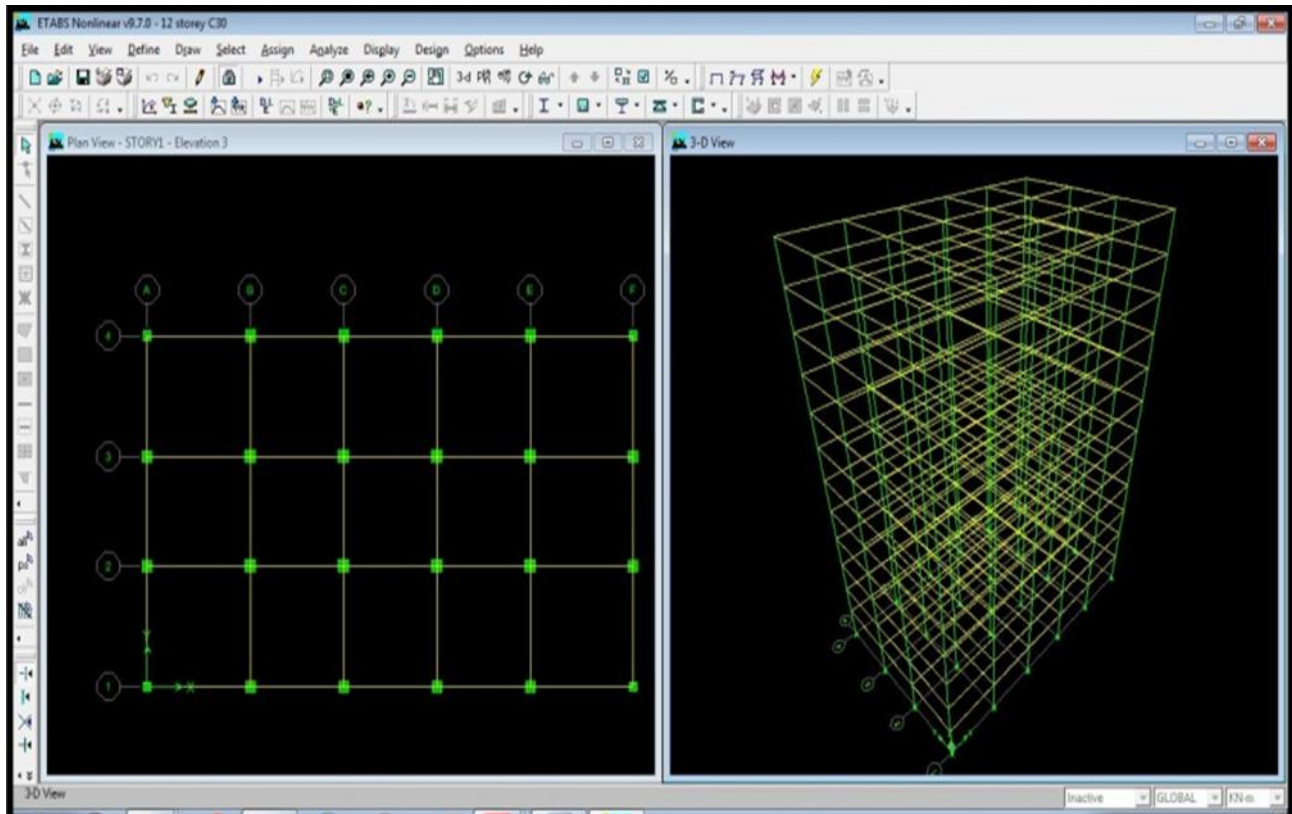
Structural plan layout and 3D ETABS model of the building.
